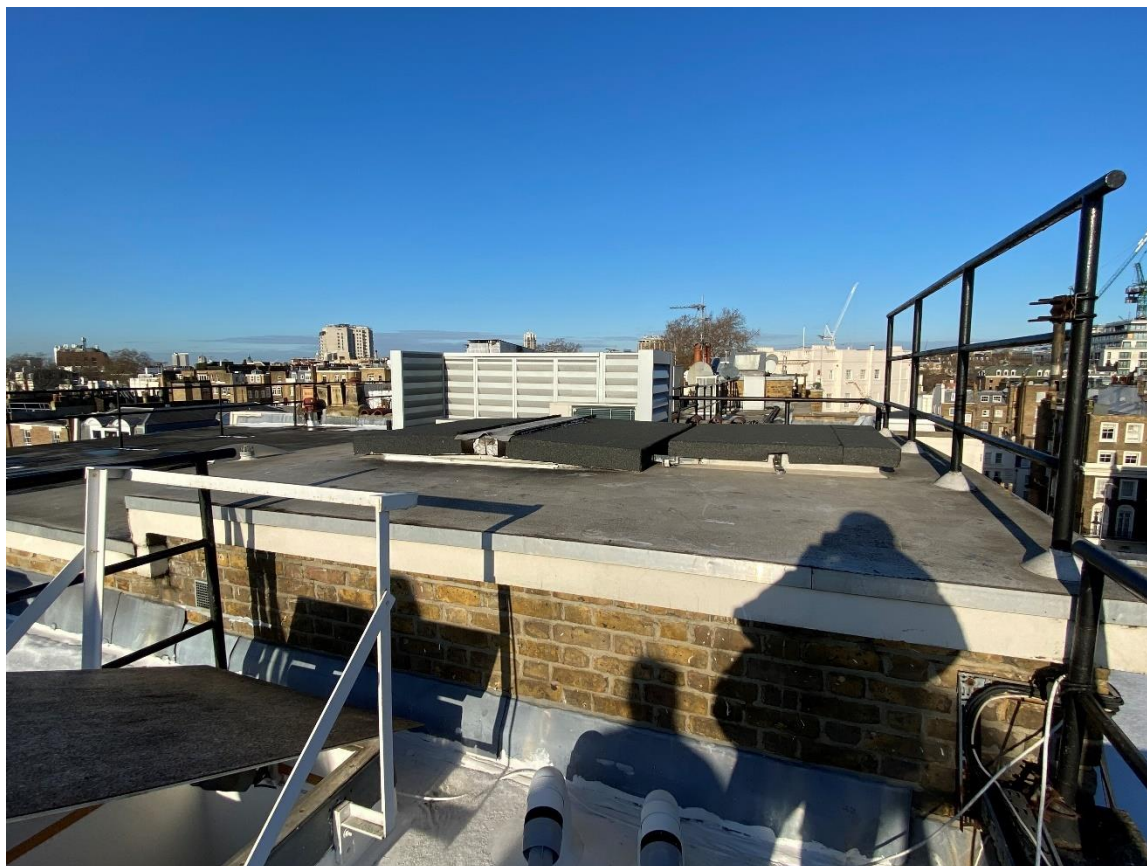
Proposed Location for the Tank Housing at 7-8 Upper Belgrave Street
